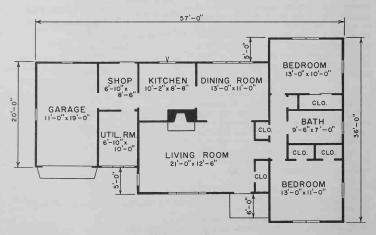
Floor plan drafting problem. Scale 1/4'' = 1' - 0''.
